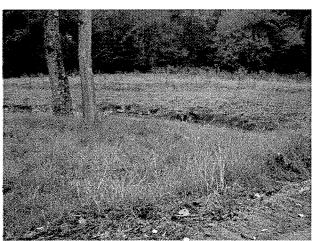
Downstream face of culvert installed at MC Station 13+29. (9/27/04)
